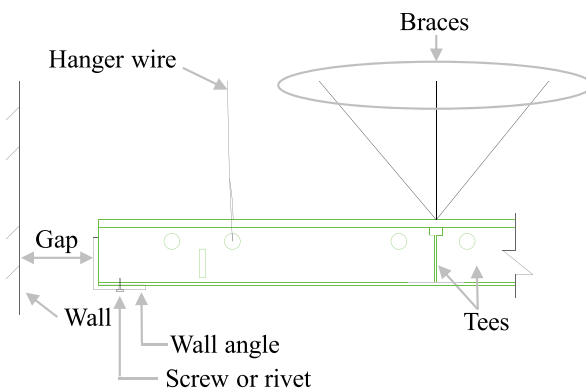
Typical edge details of a braced ceiling at the ceiling-to-wall boundary.
